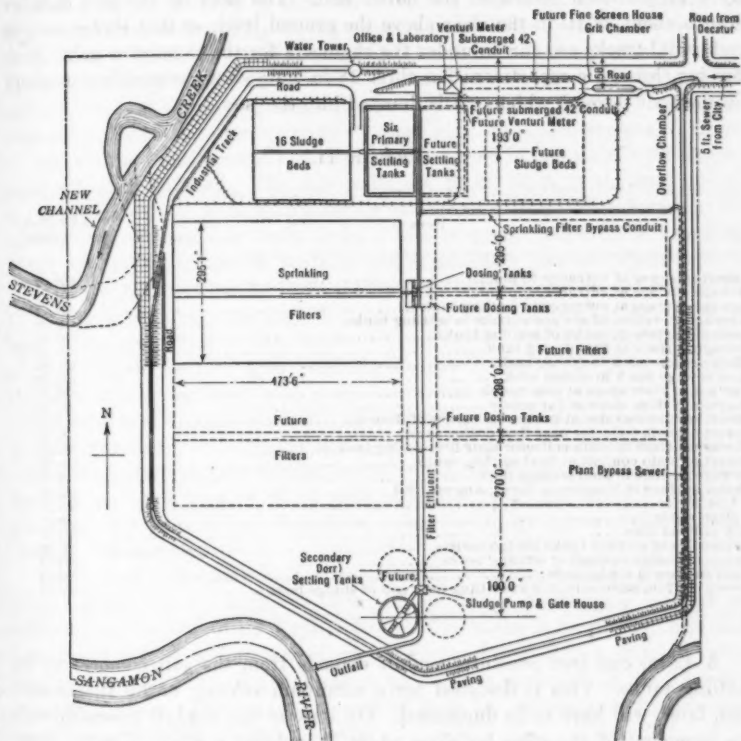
GENERAL PLAN, SEWAGE TREATMENT PLANT, DECATUR, ILL.
